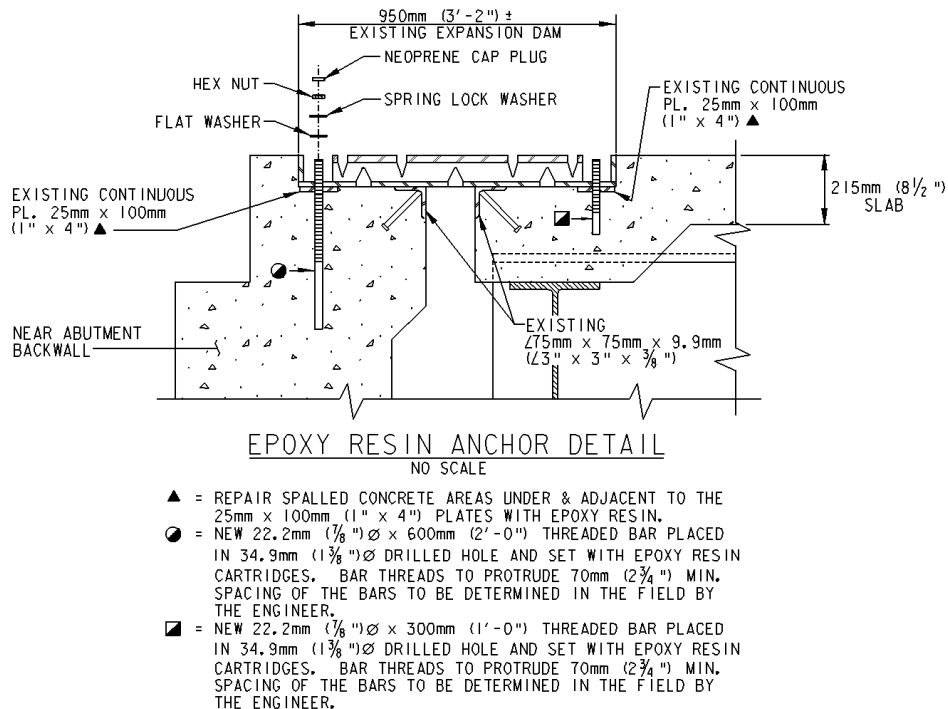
Epoxy Resin Anchor Detail
